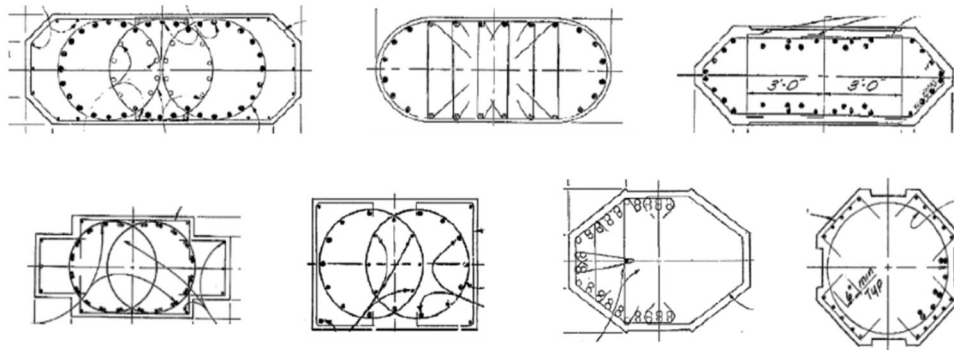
Other cross-sections used in Era-1 bridge columns
